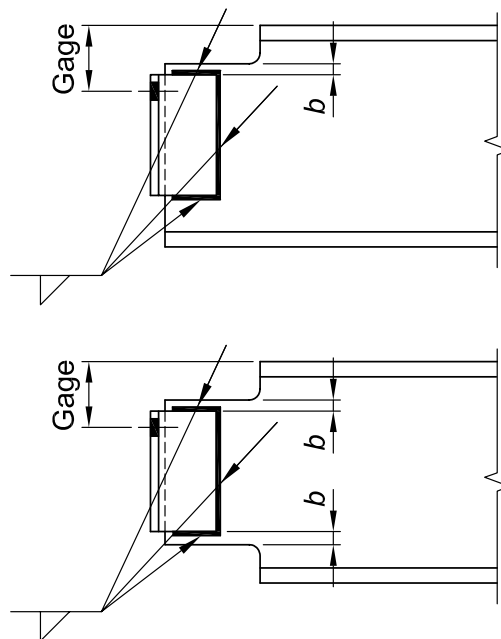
Illustration of shelf dimensions for fillet welding.
